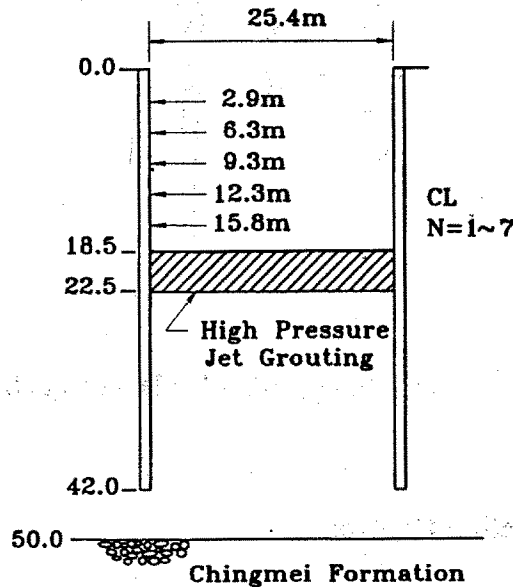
Grouted Slab at City Hall Station (TRTS)
